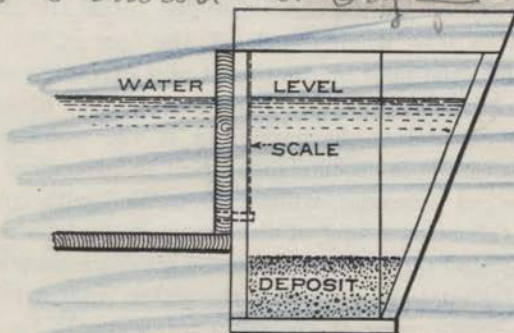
Suggested Construction of Open Stilling-well with Staff Gage or Scale Inside the Well.
